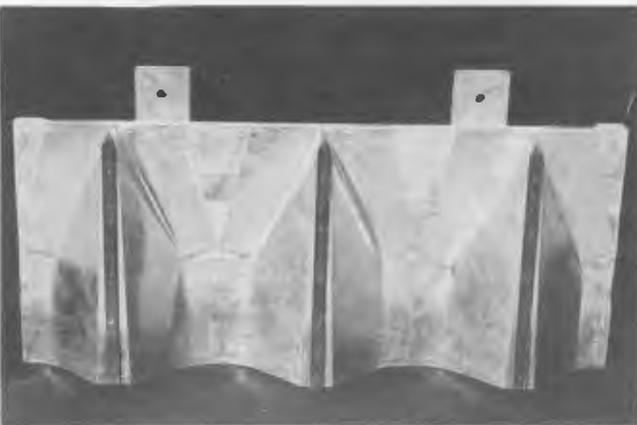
Note strap iron attachment and sheet metal attachment to under surface of platform.
